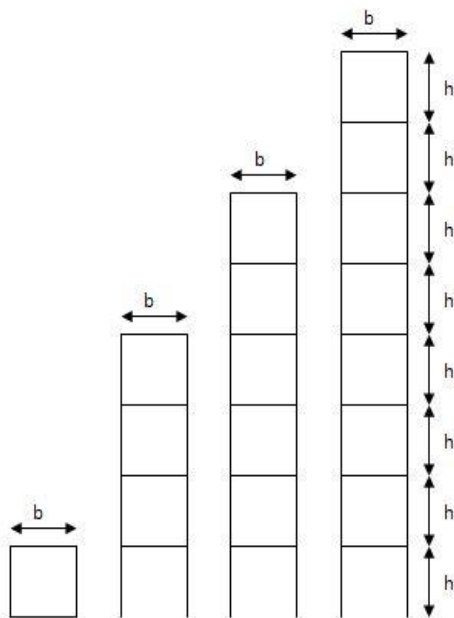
Plan and elevations of the frame models. width,  $b=3m$  and storey height,  $h=3m$ .
